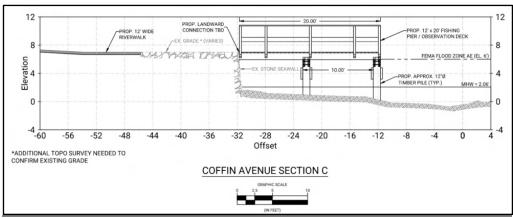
Cross section of pile-supported pier at the end of Coffin Avenue
